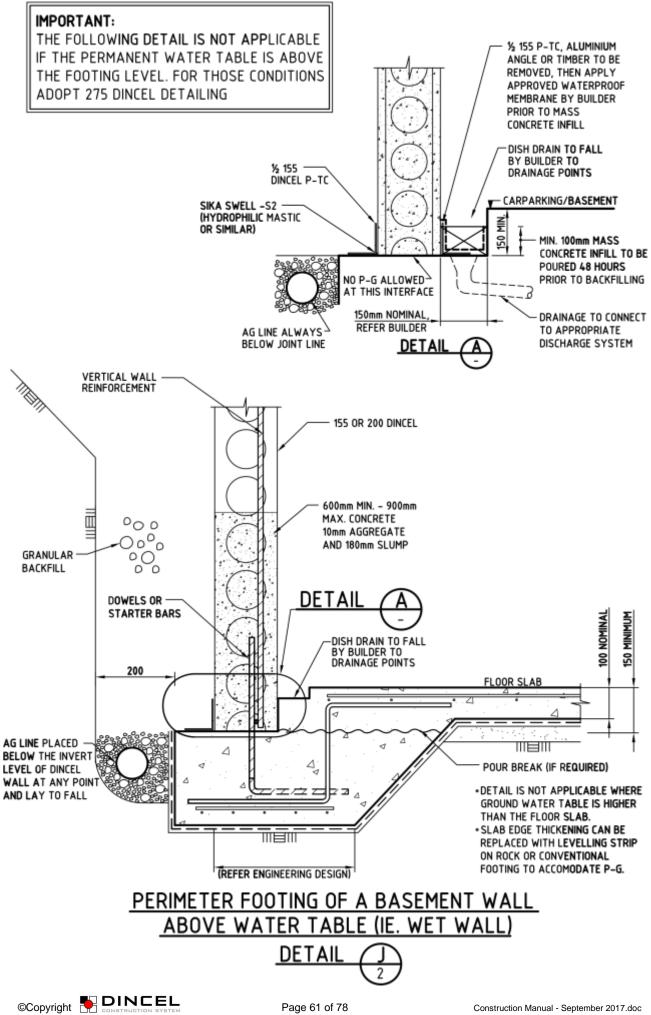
DETAILING AT FOOTINGS BELOW GROUND LEVEL
